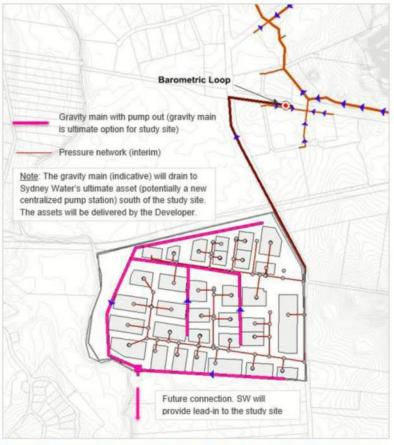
Preferred Wastewater Options - Gravity/Pump out and Pressure sewer
